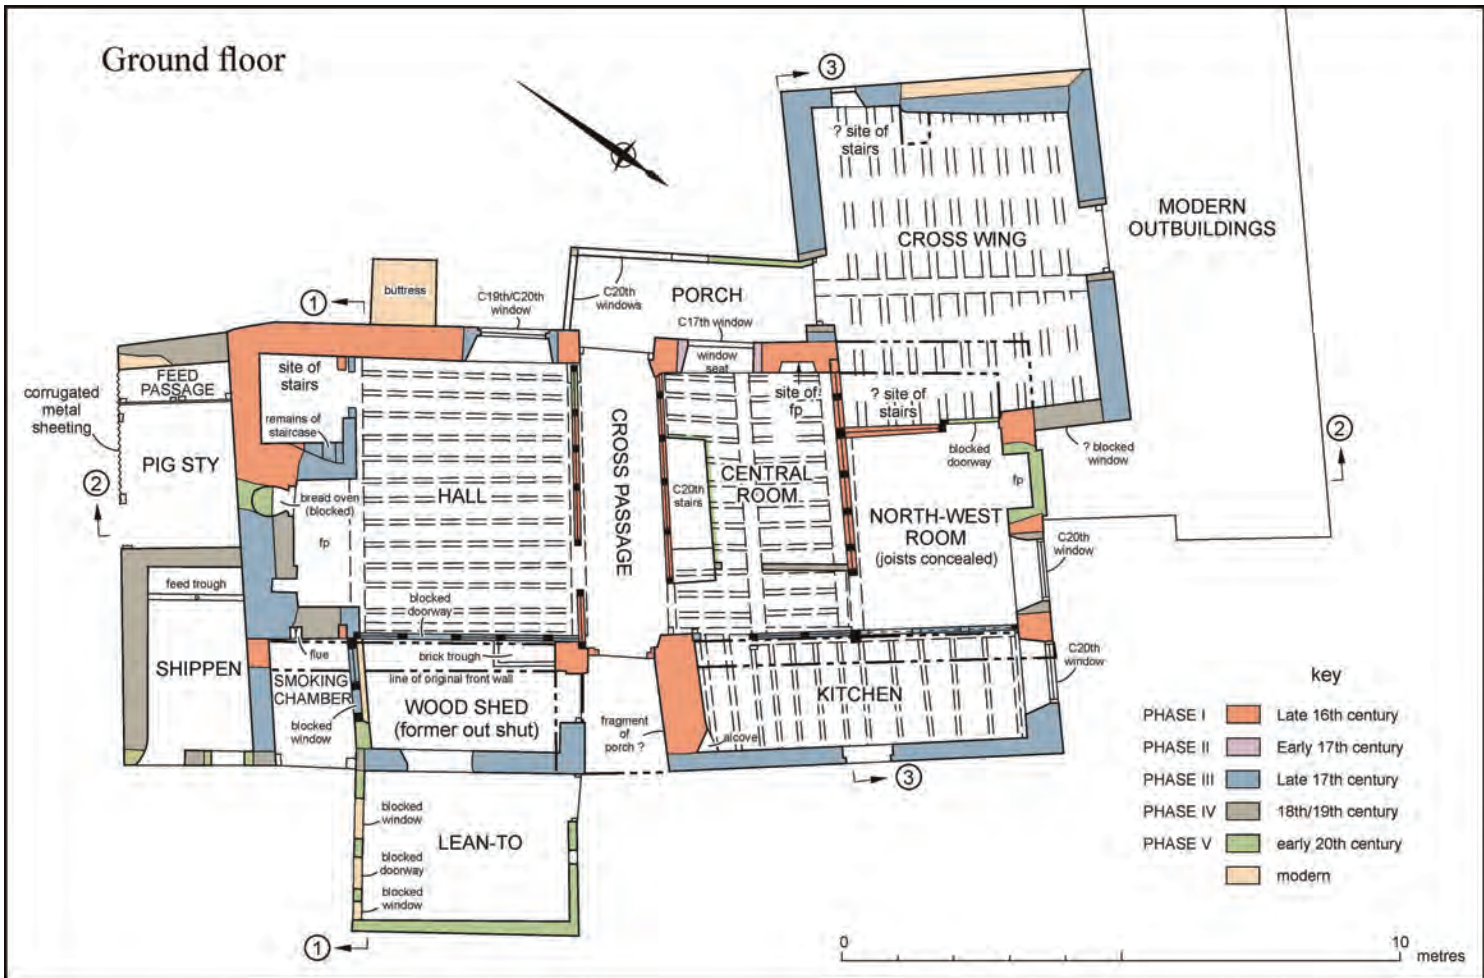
Ground-floor plan showing suggested phasing (graphic: Tony Ives)
